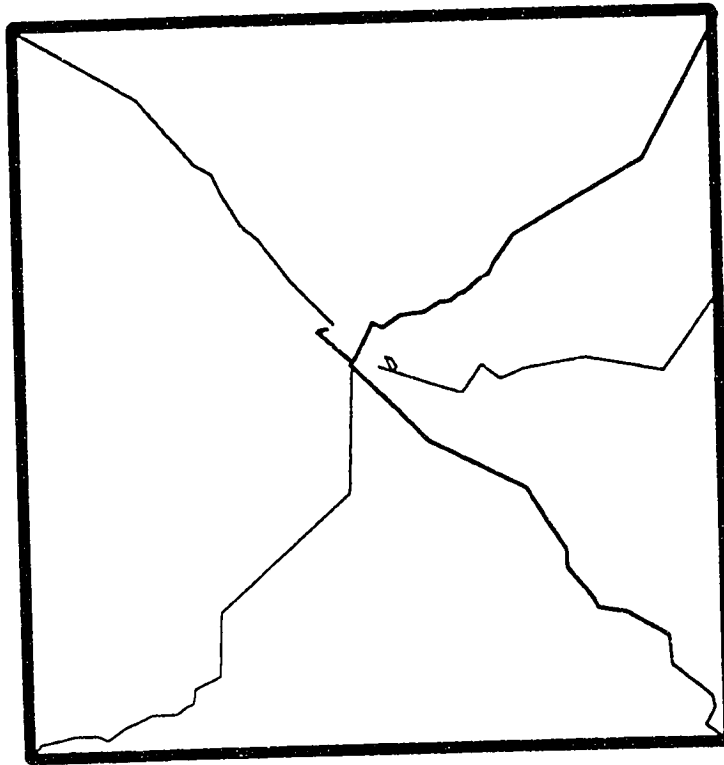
Typical Plastic Shrinkage Cracks in 70 % Blast Furnace Slag Cement Concrete Specimens Exposed to a RH of 25 %, Temperature of 45 °C and a Wind Velocity of 15 kmph
